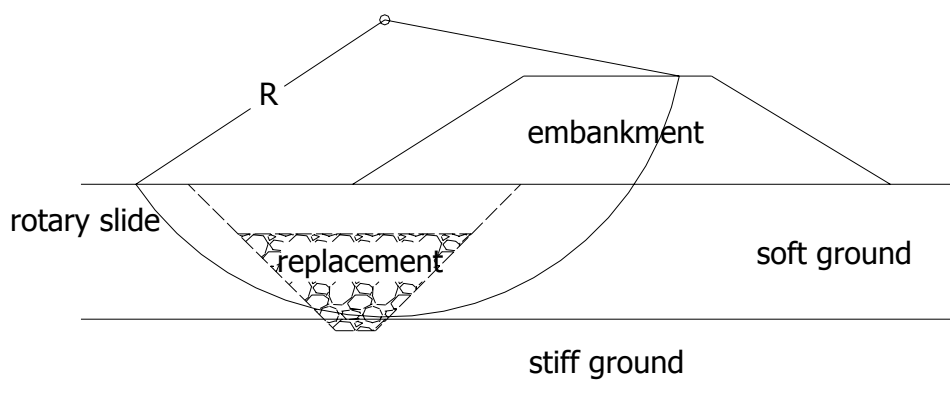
Example of embankment construction with partial replacement of soft ground in the area of the embankment base using stone material
